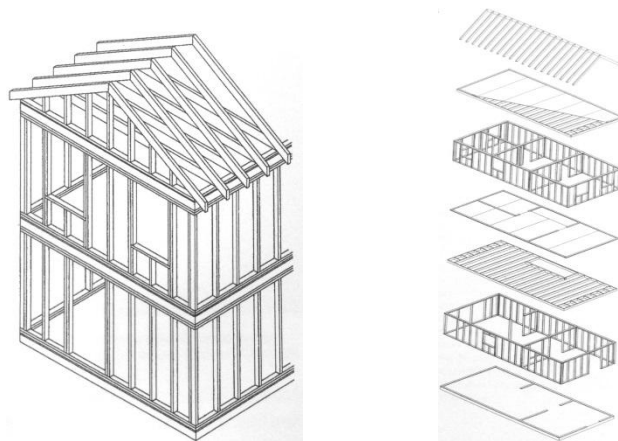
Platform frame construction (in platform frame construction the elements are stacked storey by storey) [6]
